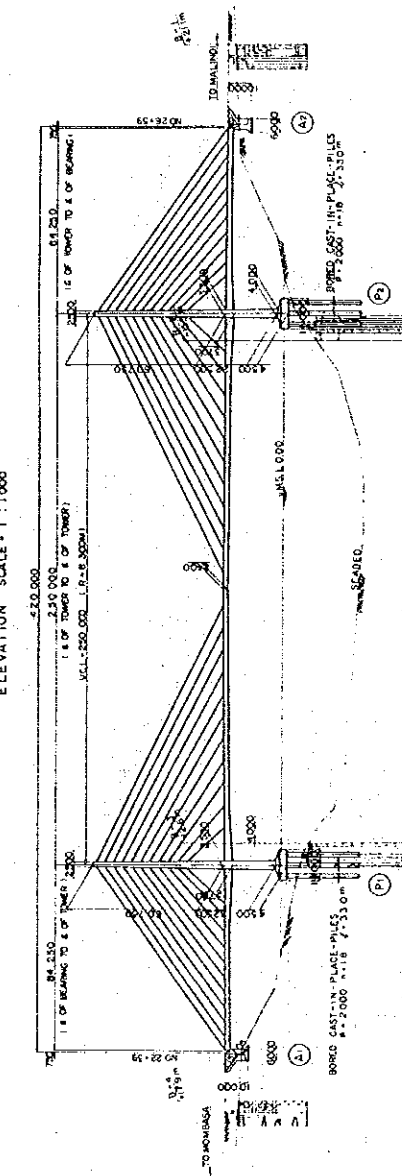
PROFILE AND SUBSURFACE CONDITION AROUND ABUTMENTS
